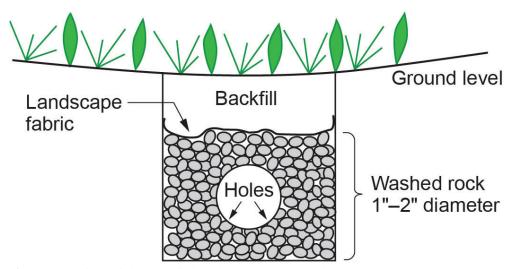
Typical French drain. (Skilled Trades BC, 2021) Used with permission.
